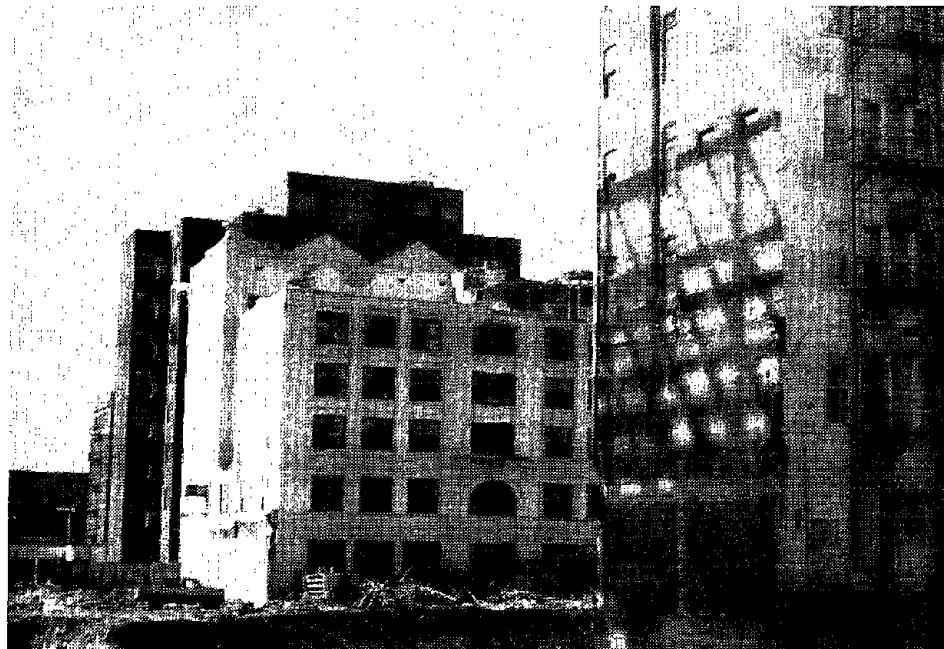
MULTI-STORY URM BUILDING WITH INTERIOR STRUCTURAL FRAMING OF REINFORCED CONCRETE AND STRUCTURAL STEEL
